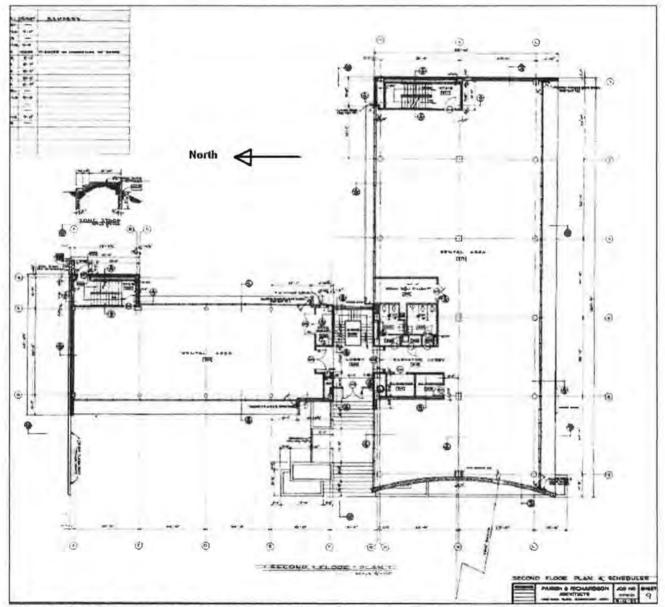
Second floor plan, (Architect's Drawings, dimensions and some notations erased and direction arrow added (Original architect's drawings, 1957, in the owner's archives)
